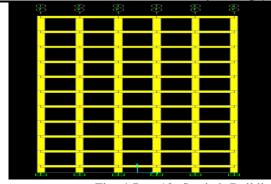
10 Storied Building Without Water Tank – Elevation
